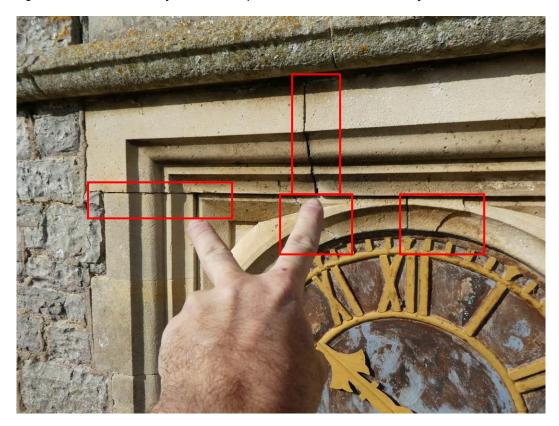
P1000325 Fractures & Open Joints in East Elevation Clock Surround
